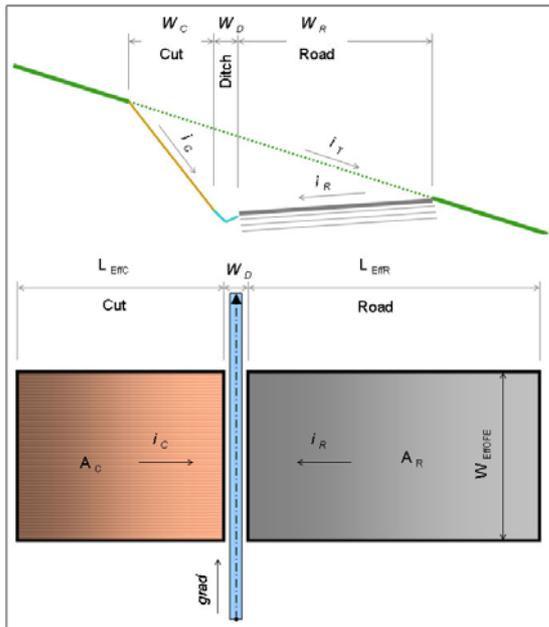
Cross section and surface elements (Cut and Road) of an insloped forest road.
